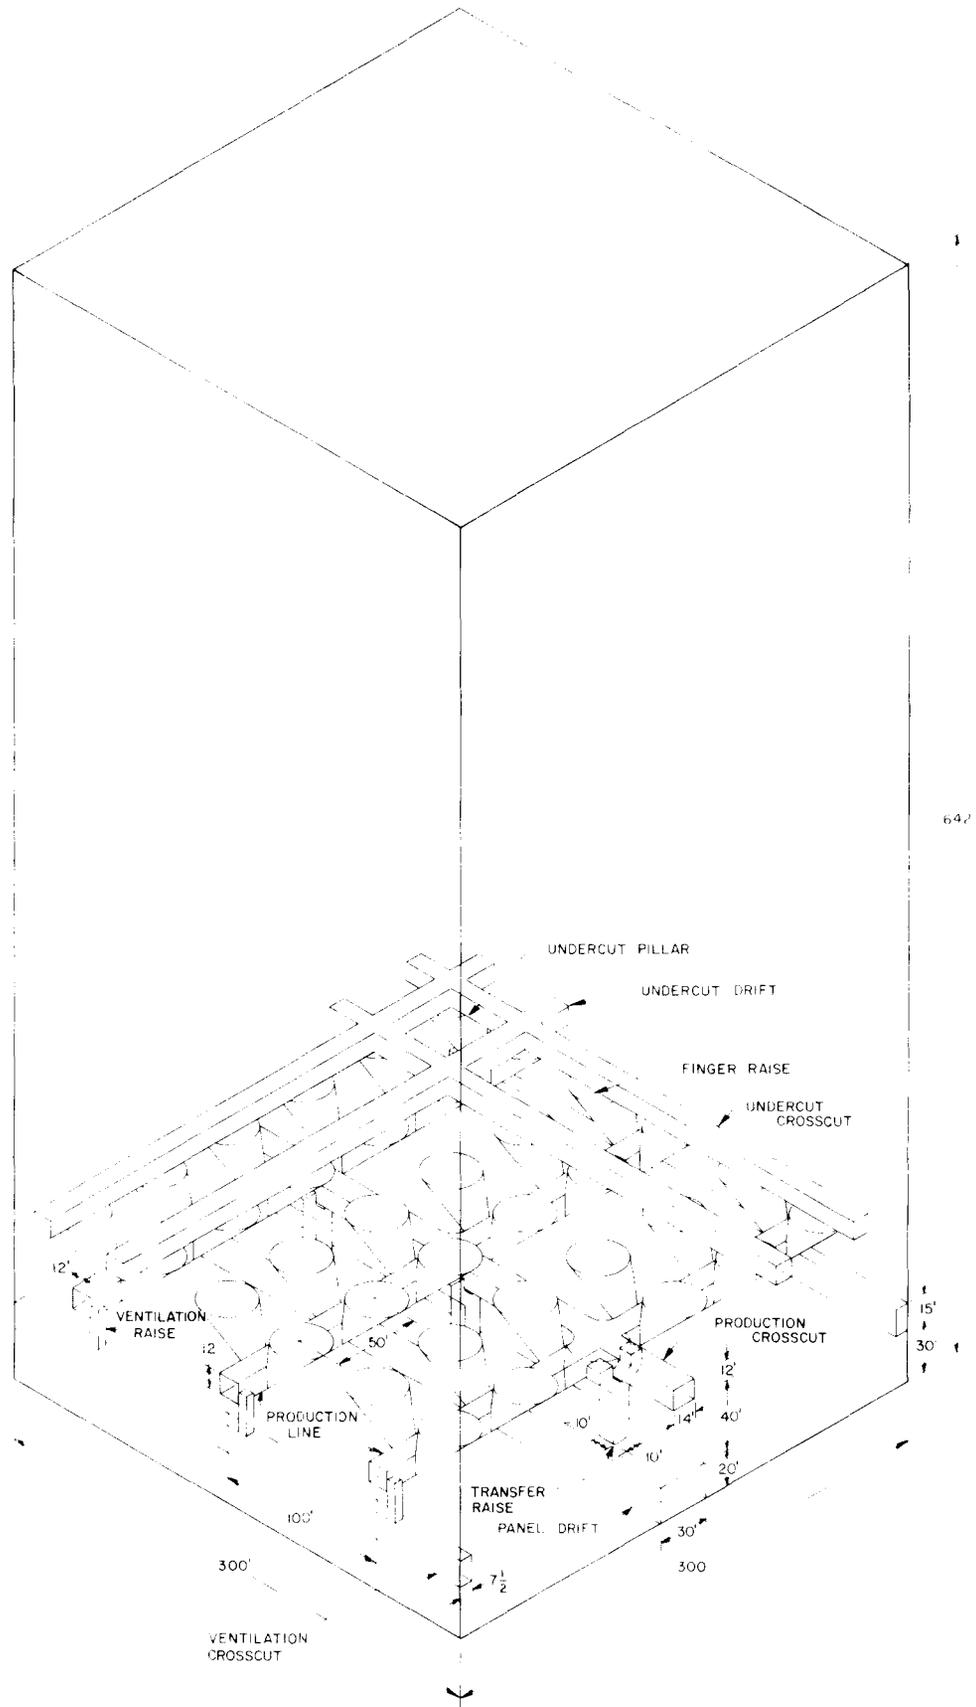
Isometric View of One Block, Block Caving with LHD's
